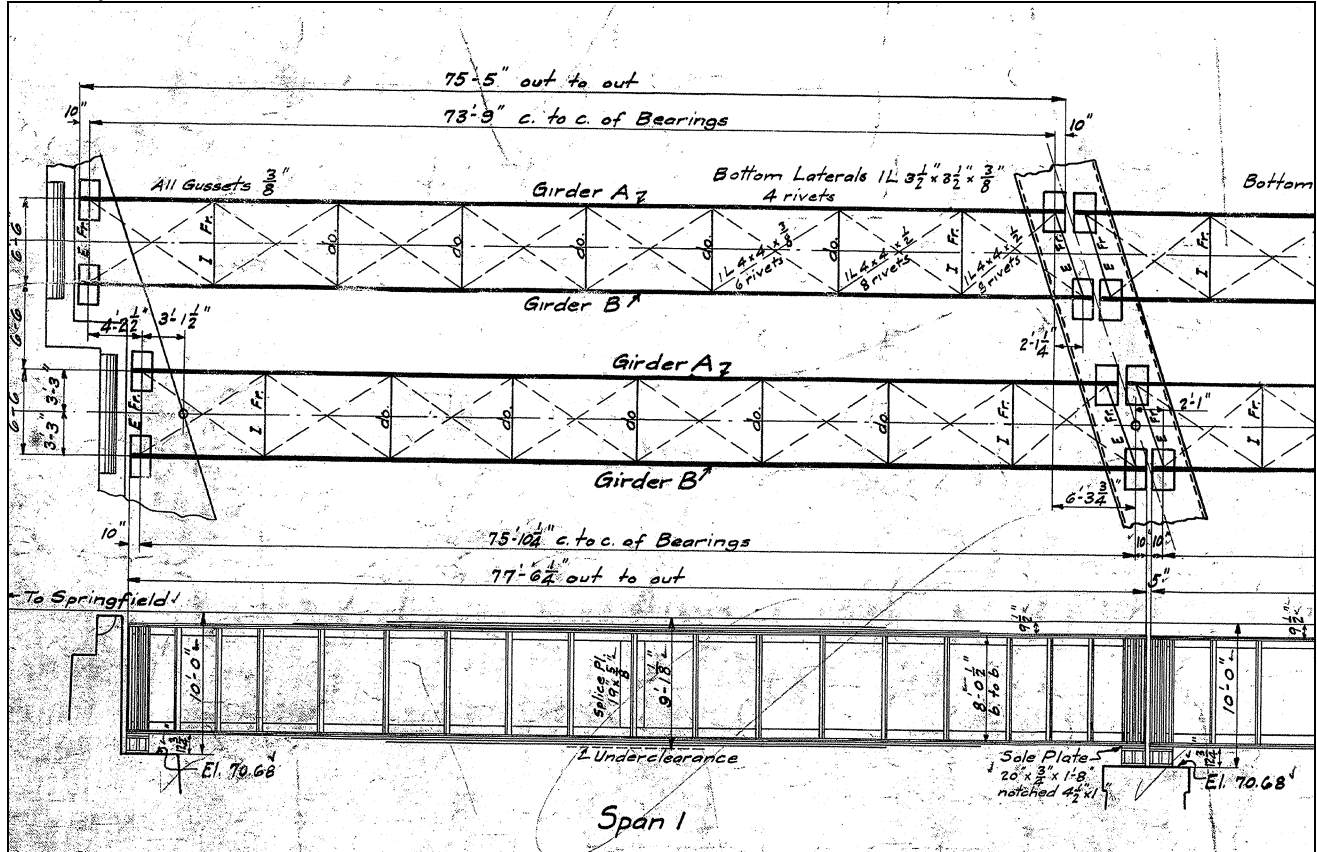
Enlarged portion of original plan sheet showing plan and elevation of Span 1 (source: Massachusetts Bay Transportation Authority files).
